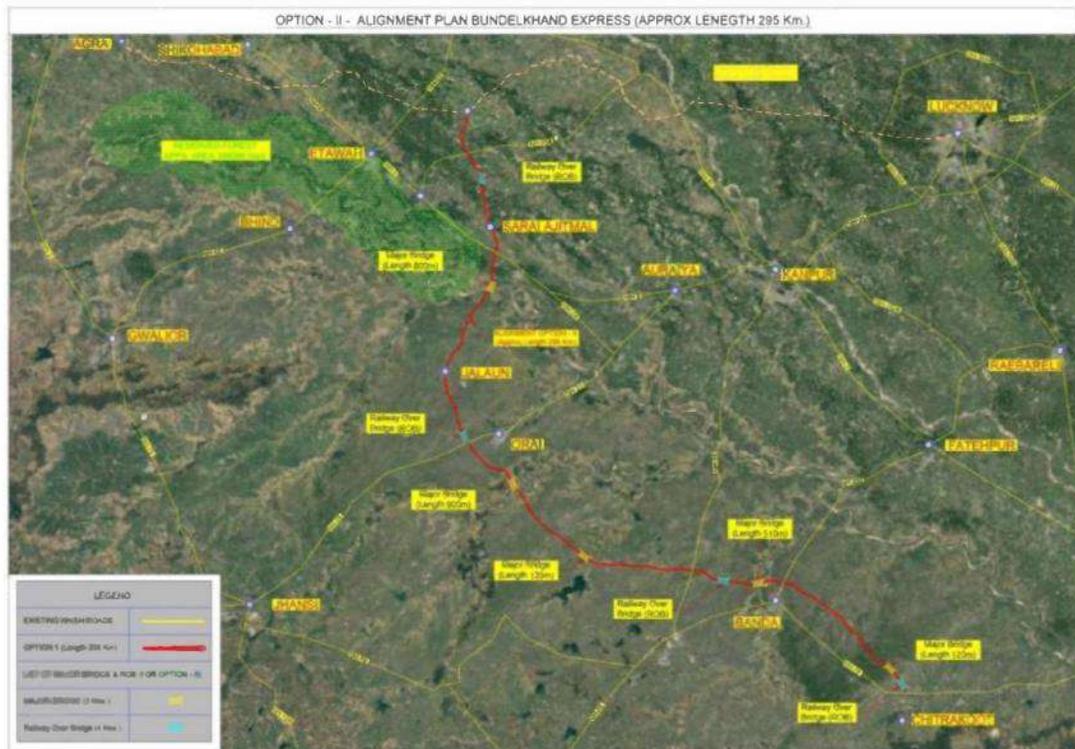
Alternate-2 – Alignment plan (Approx. Length 295Km)
